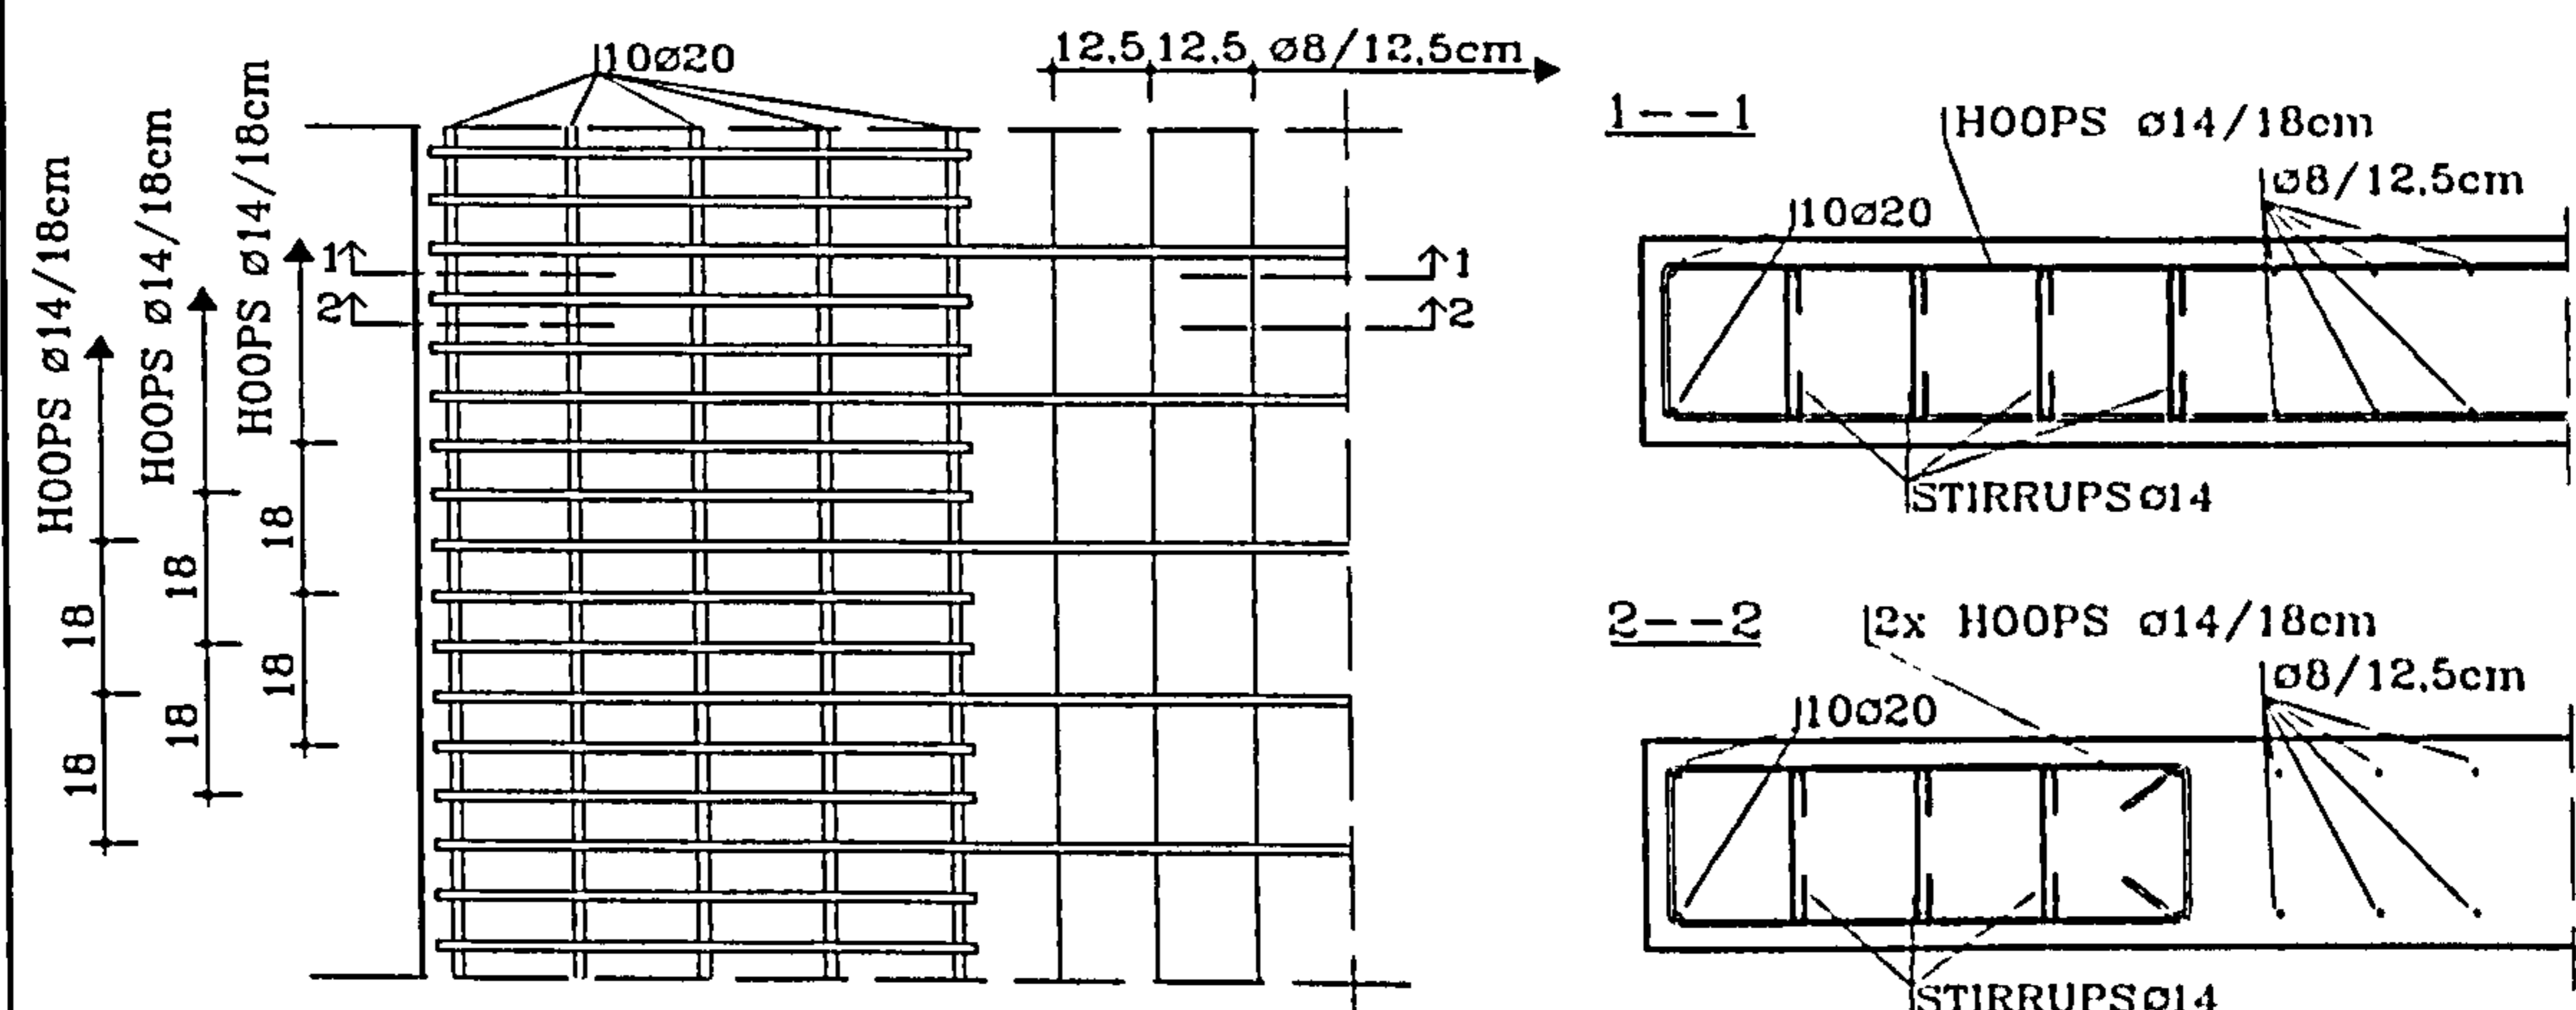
Design for Confinement and Reinforcement Details of an 8-Storey Wall
